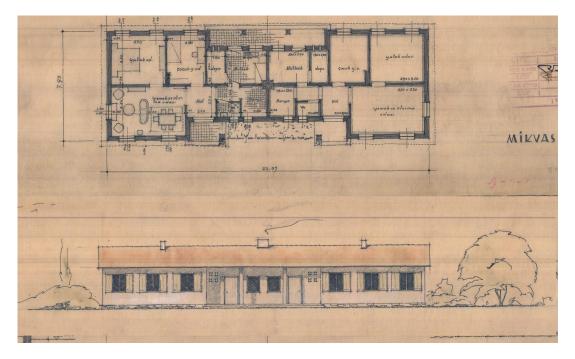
The original drawing sheet of the second proposal of the double dwellings of officers, the ground floor plan and the south elevation, Construction Section in General Directorate of TEKEL, 02.04.1942 (Source: TTA Archive)
